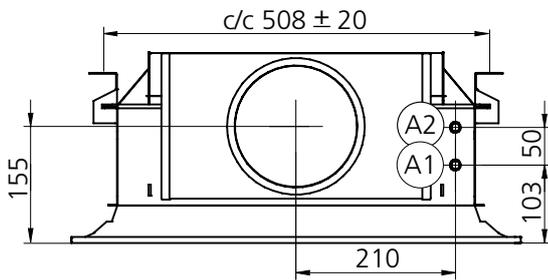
Dimensional drawing, end-view with water connections. Air connection on the short side - pos 1.
